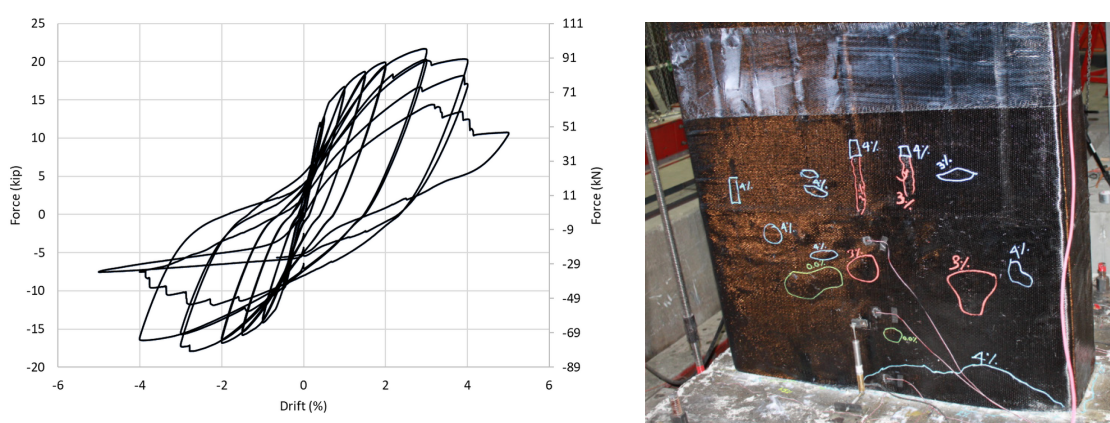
Hysteresis and CFRP wrap debonding areas at 5.0% drift ratio for repaired as-built wall pier
